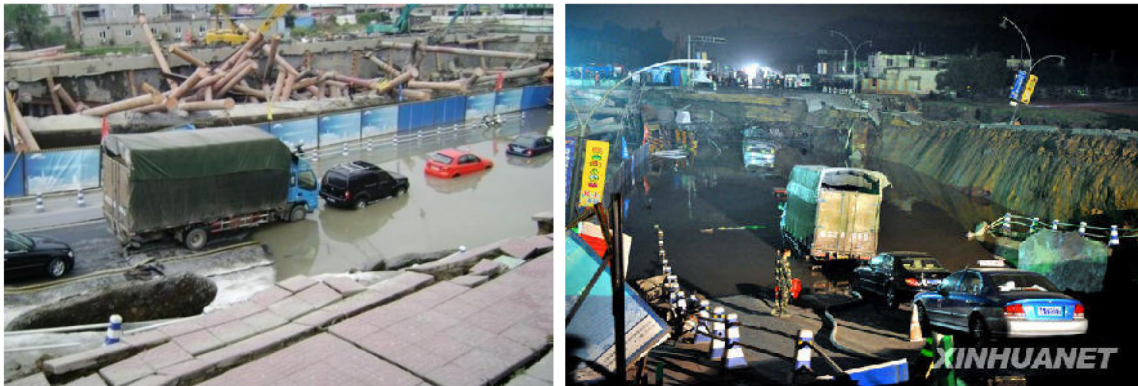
Onsite sceneries of Hangzhou underground railway tunnel collapse accident in 2008
